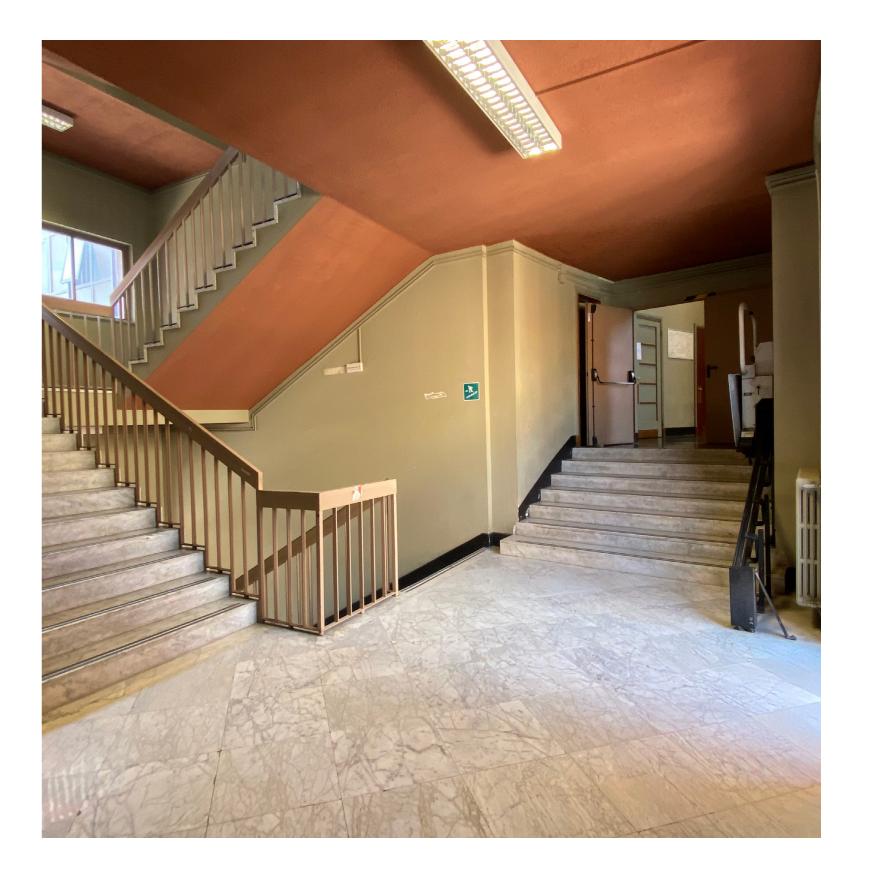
The hall of the classroom tower on the first floor; note the niche over the door leading to the staircase, closed by a wall and a fire door (© Salvo 2021)
